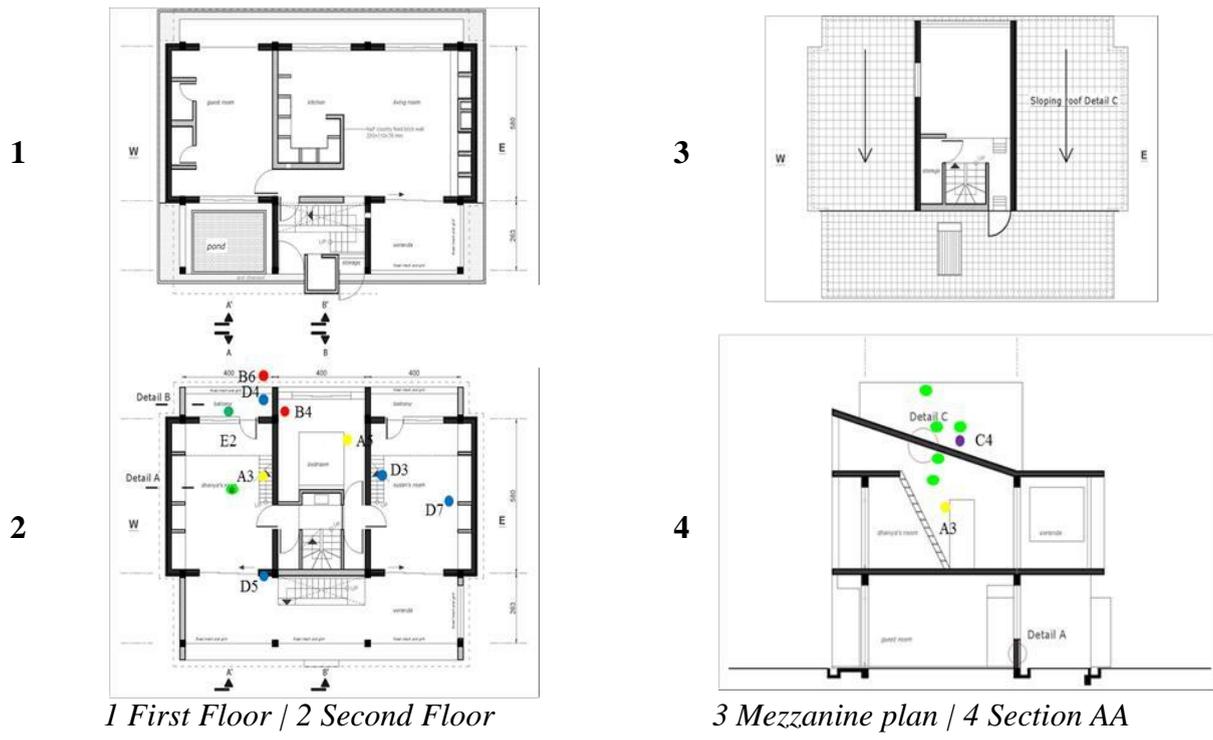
, Placement of loggers, plan, elevation, section, Blessing house
